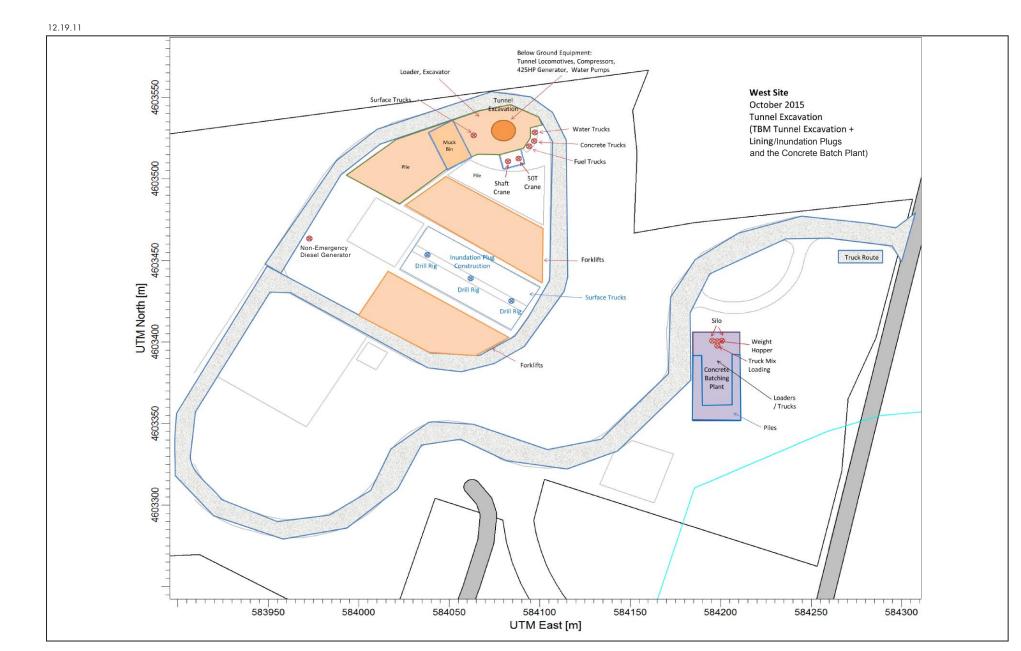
West Connection Site: Phase 3 Tunnel Excavation and Concrete Batch Plant Locations of Equipment
